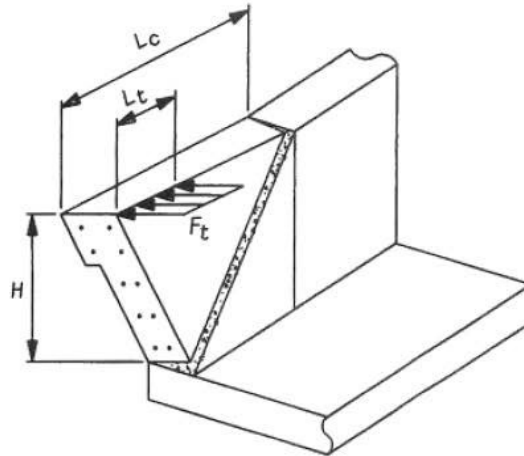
Yield Line Analysis of Concrete Parapet Walls for Impact near End of Wall Segment
